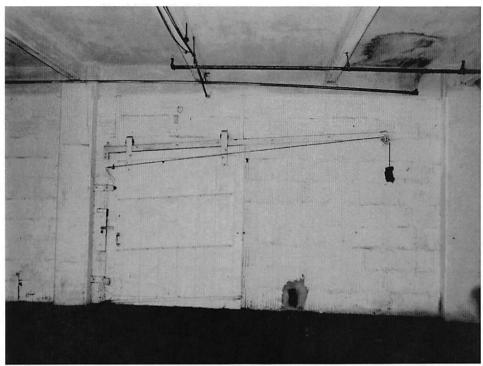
Interior, first floor Unit D, interior automatic fire door, looking north.
